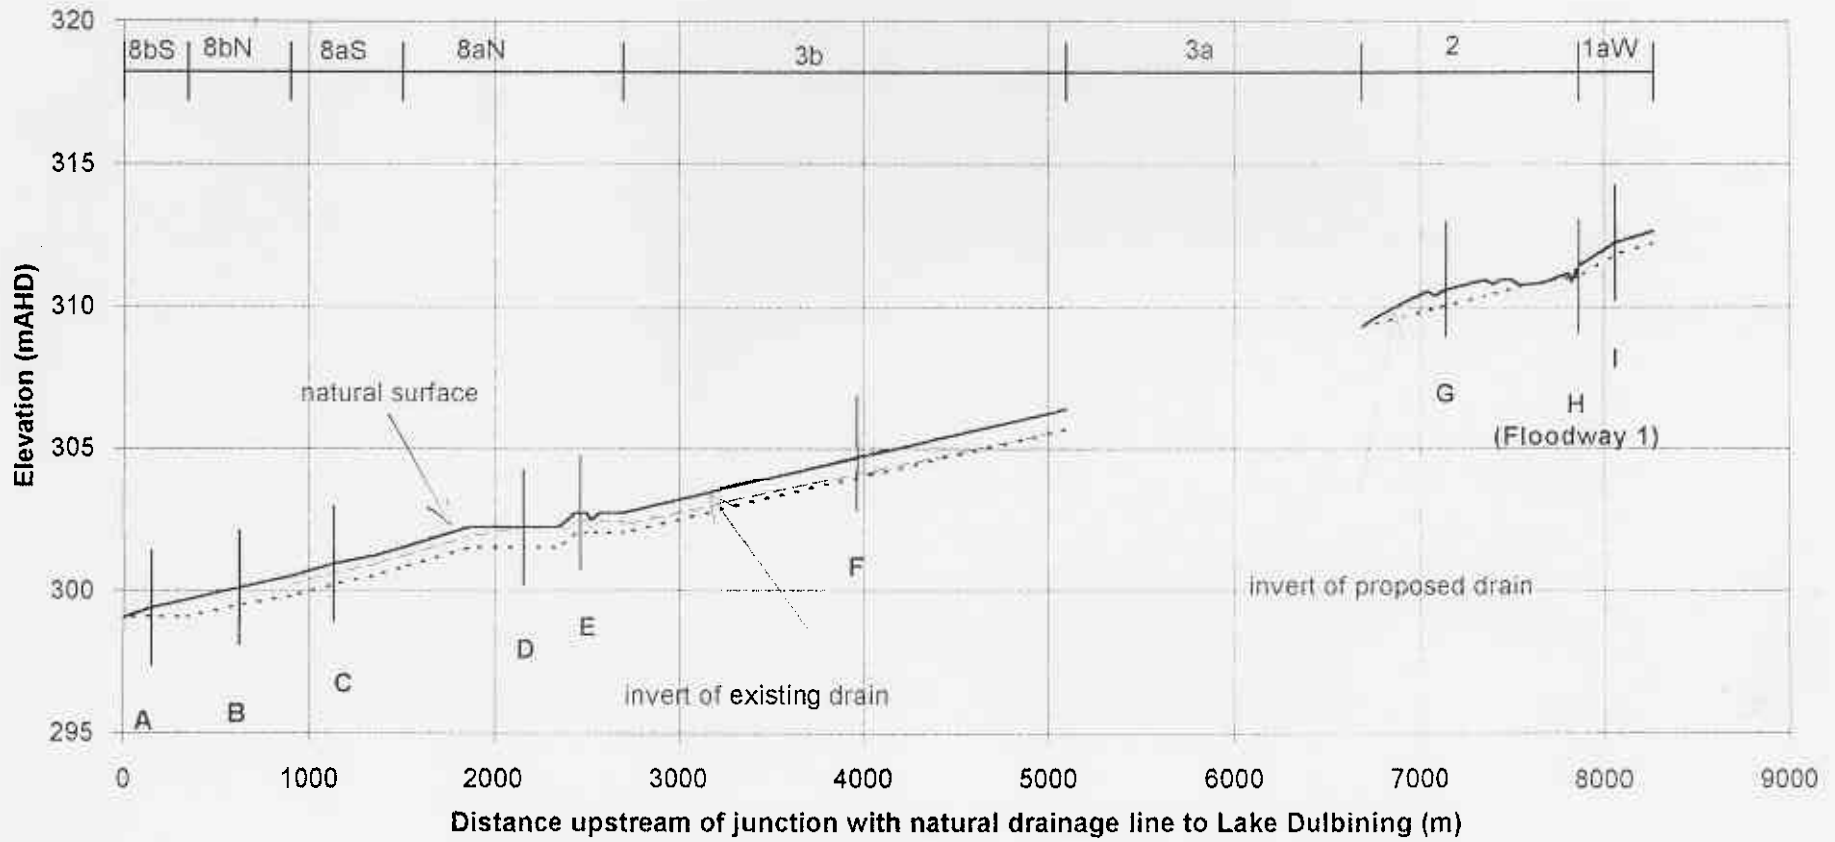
LONG SECTION - WESTERN DRAINAGE BRANCH
